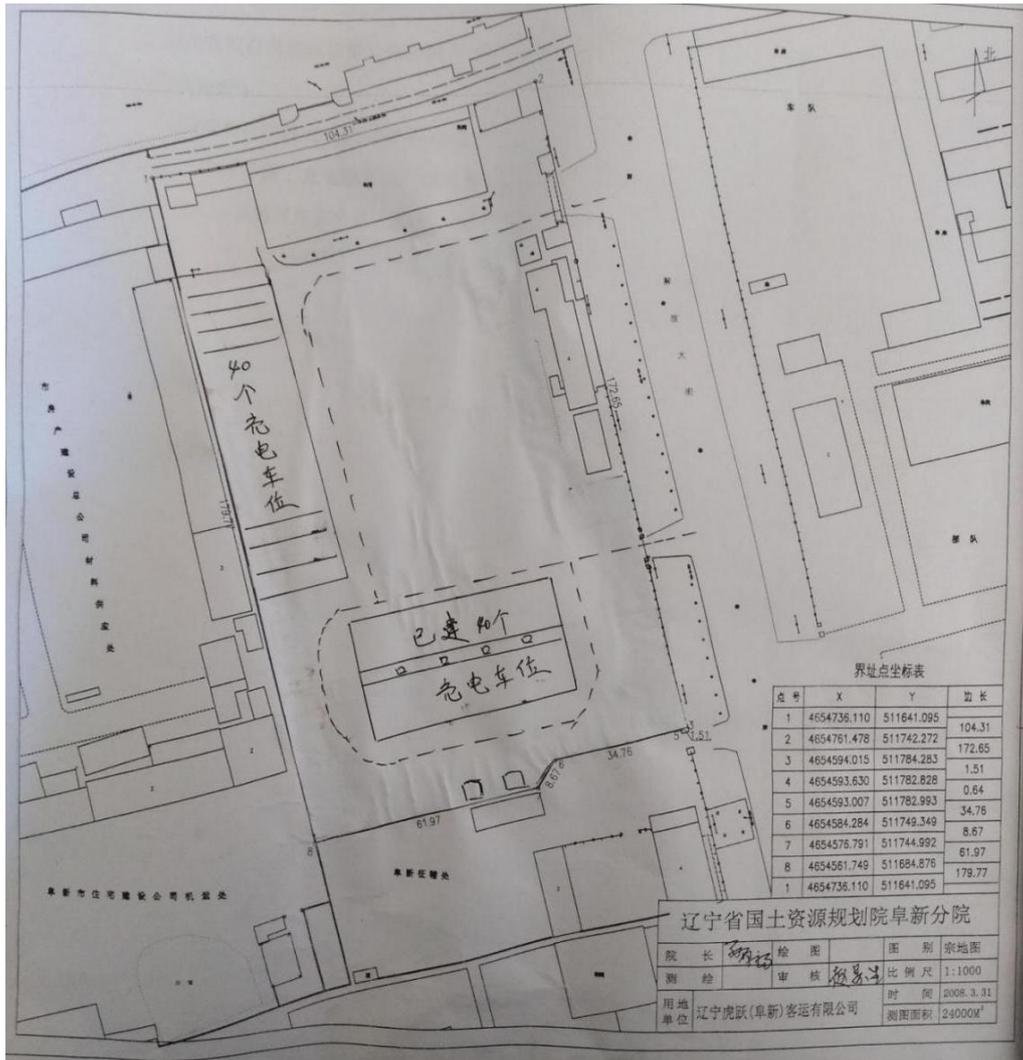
Fuxin City Public Transportation Comprehensive Parking Lot Renovation and E-buses Depot Layout Plan
